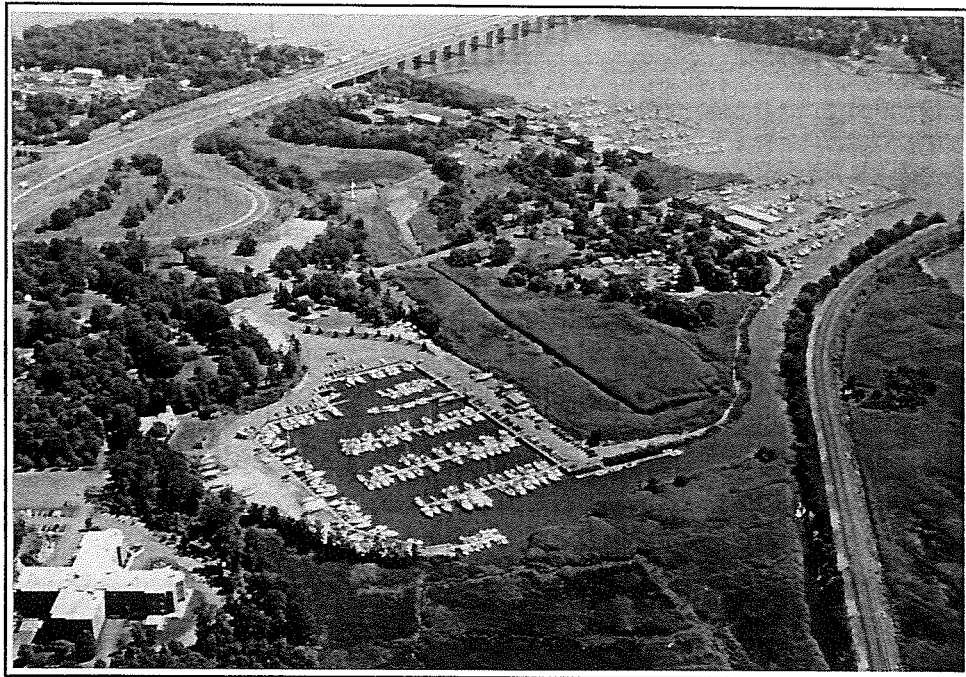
Ragged Rock Marina basin and channel; railroad embankment at lower right; I-95 and Baldwin Bridge at upper left.
